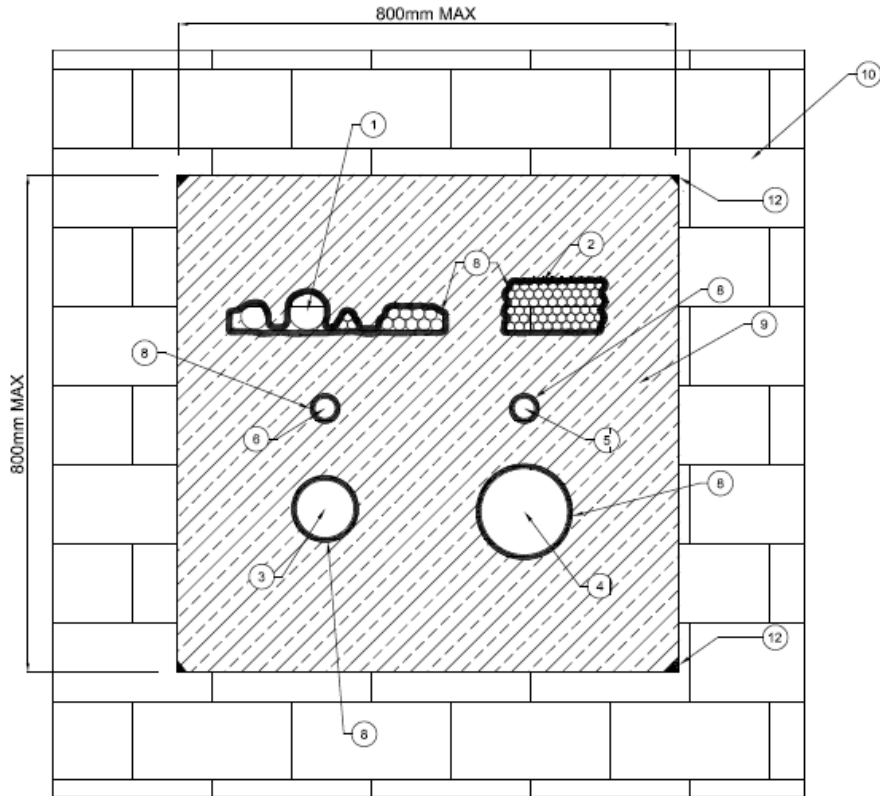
Typical arrangement of apertures filled with 3M Fire Barrier Pillows in walls
